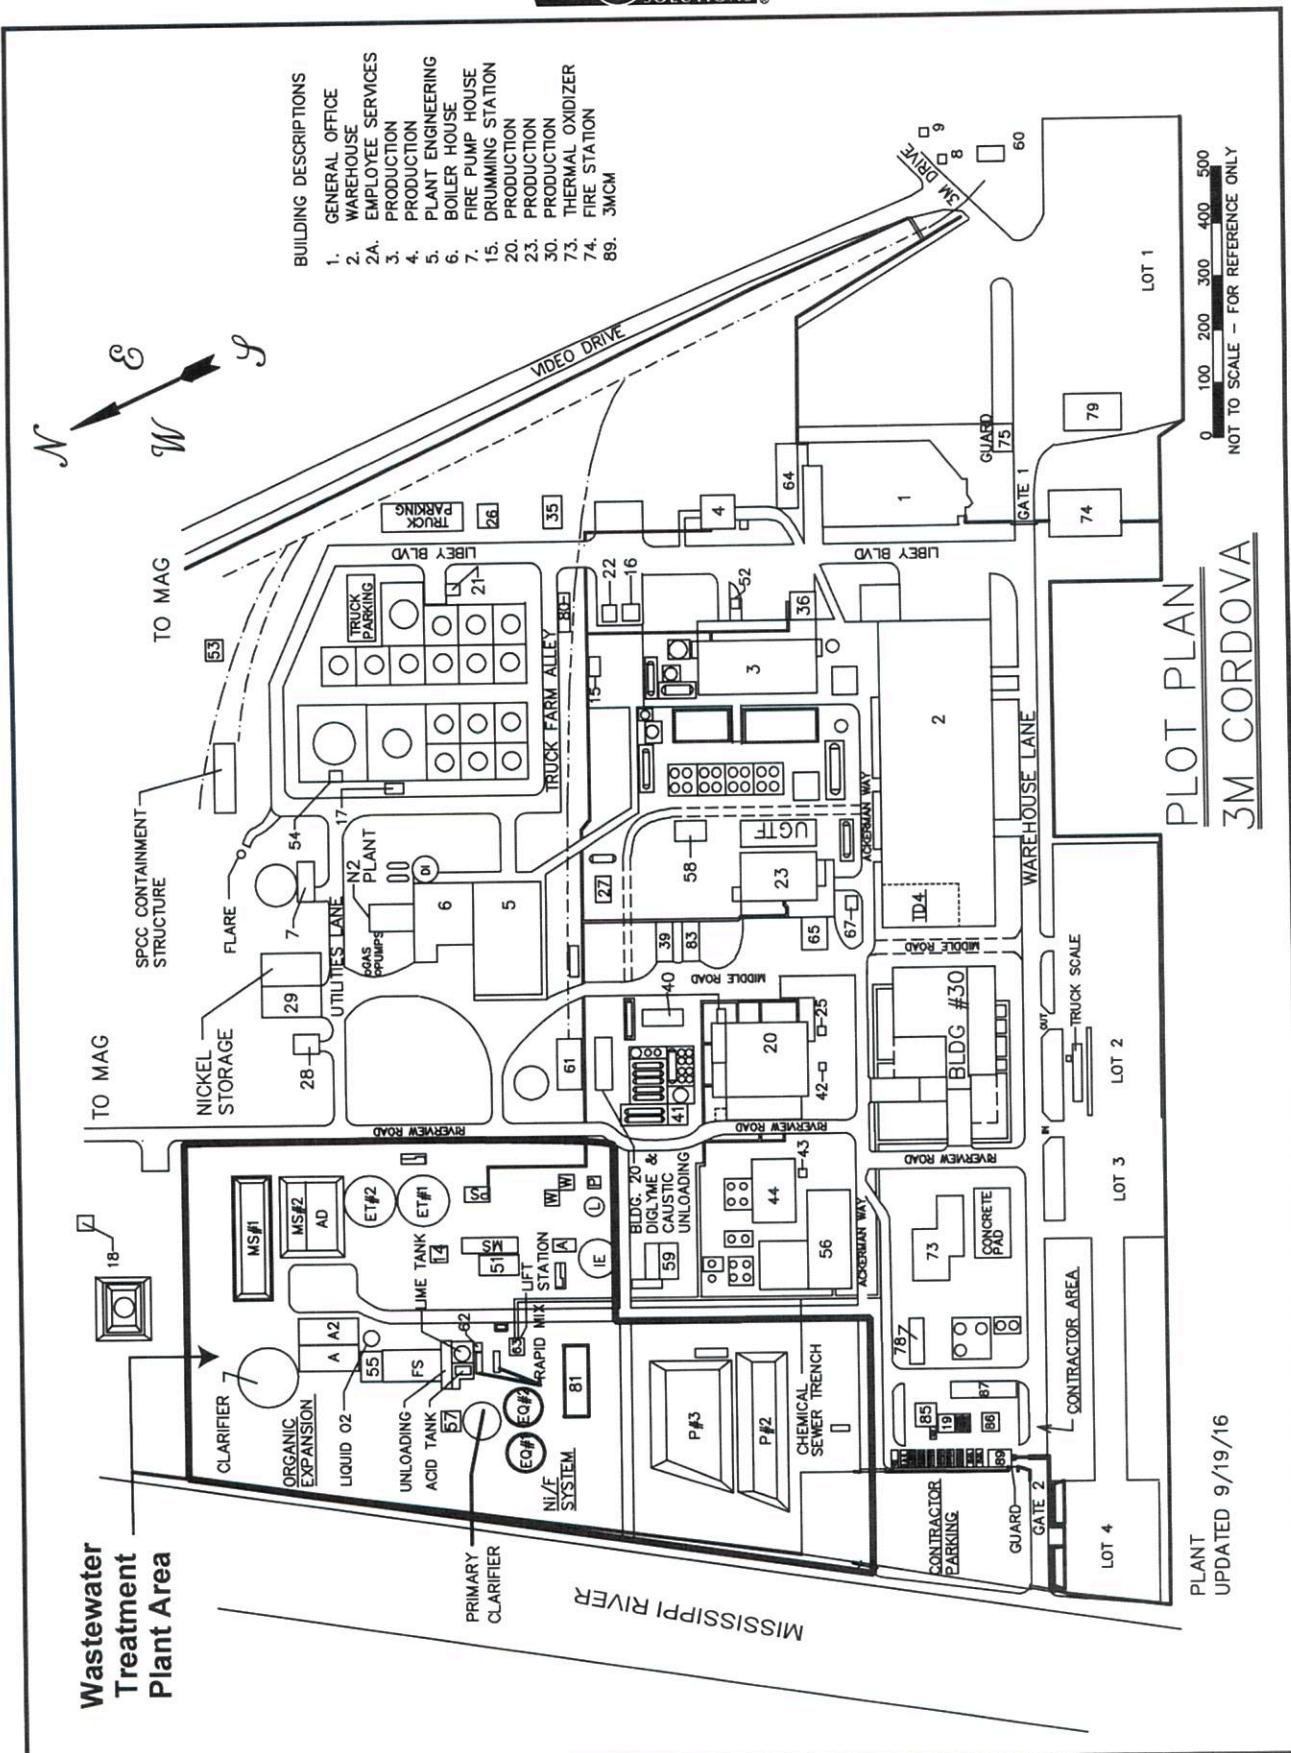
SITE LAYOUT, MANUFACTURING AREA
